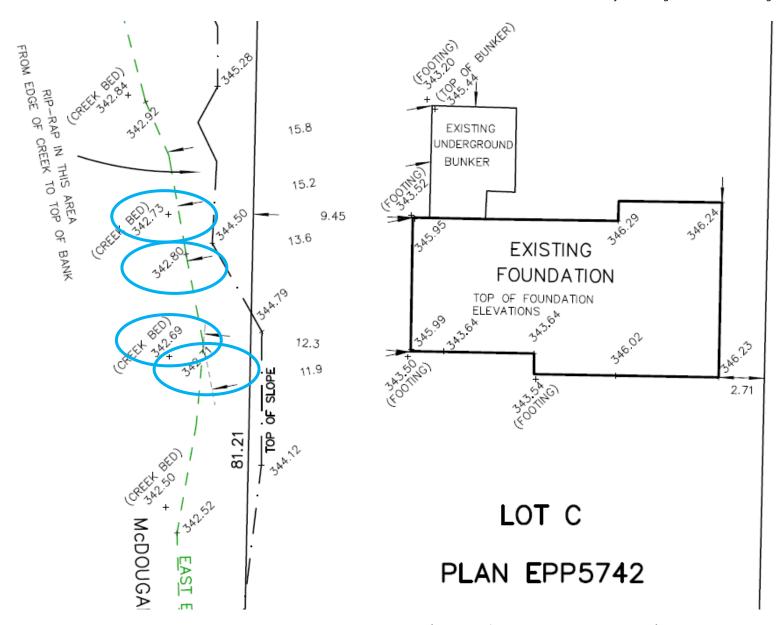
McDougall Creek Natural Boundary Elevations – (average of 4 circled elevations = 342.7m)
